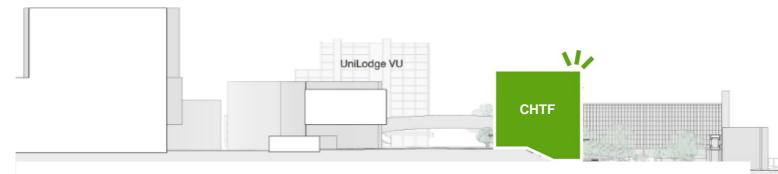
Footscray Park Campus site section (not to scale) | Source: DCM
